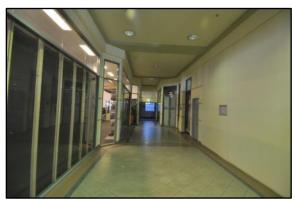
View along corridor on first floor towards rear of building. Contemporary wall, floor and ceiling finishes.
